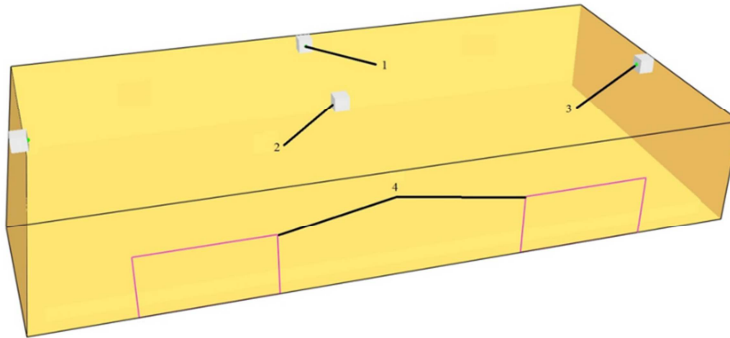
Diagram of the room with the temperature sensors: 1 – wall (near ceiling); 2 – ceiling; 3 – column (near ceiling); 4 – openings.
